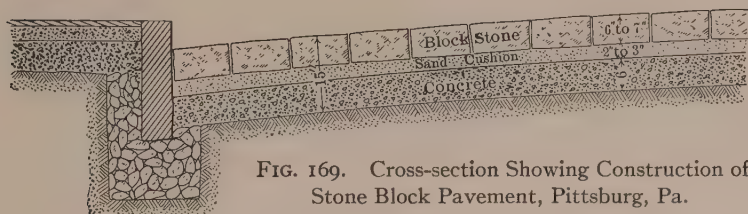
Cross-section Showing Construction of Stone Block Pavement, Pittsburg, Pa.
